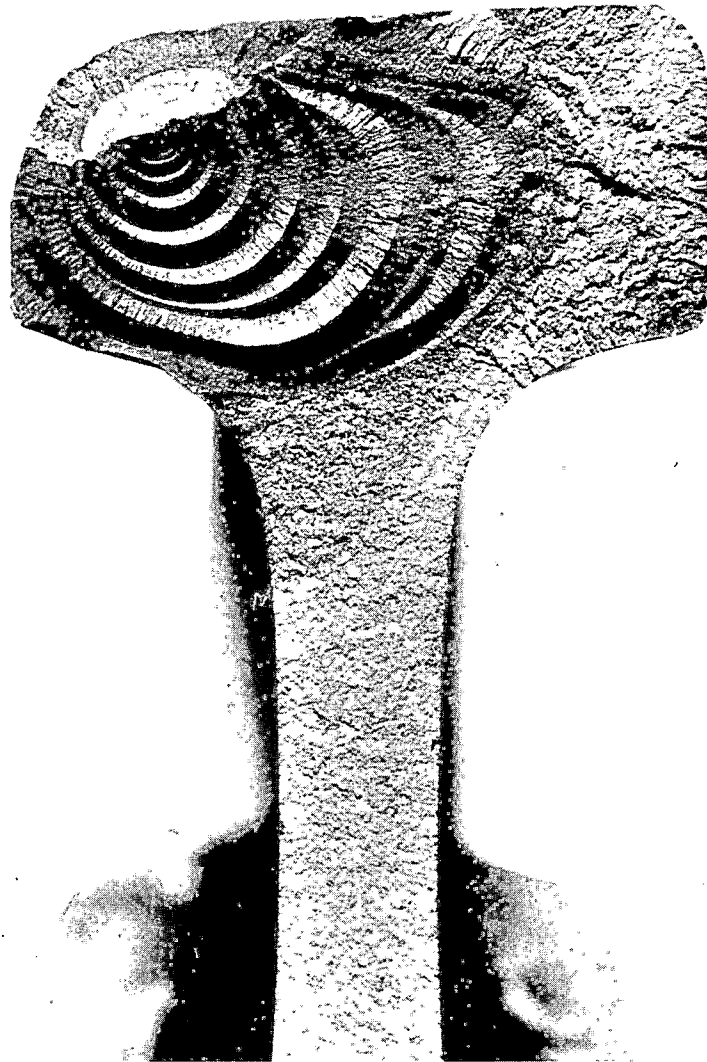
DETAIL FRACTURE FROM SHELL.
